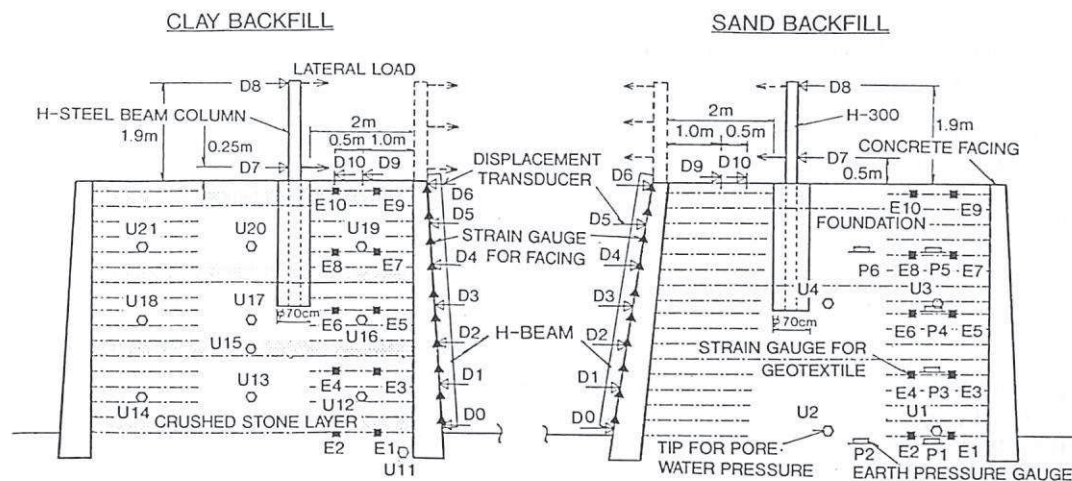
Cross-sections of test GRS-RWs with column foundations
